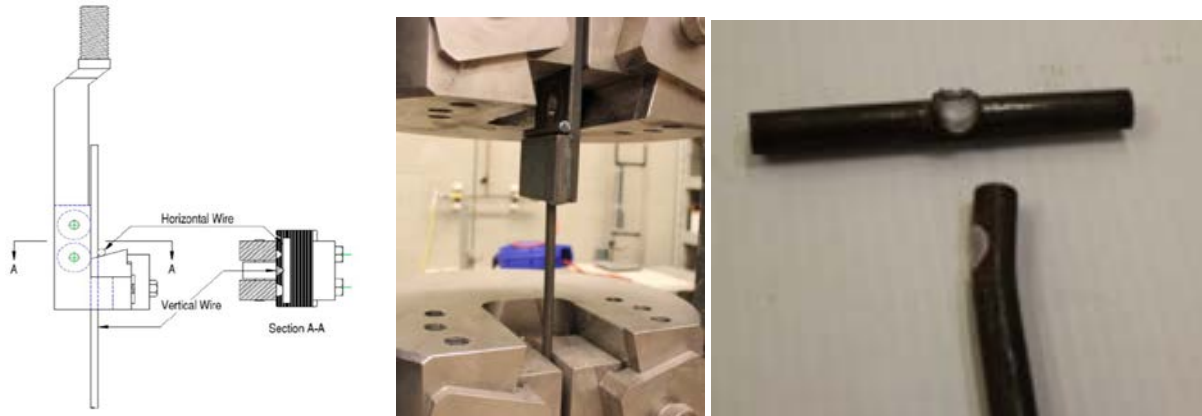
ASTM welded wire reinforcement weld tester [7, 9]
